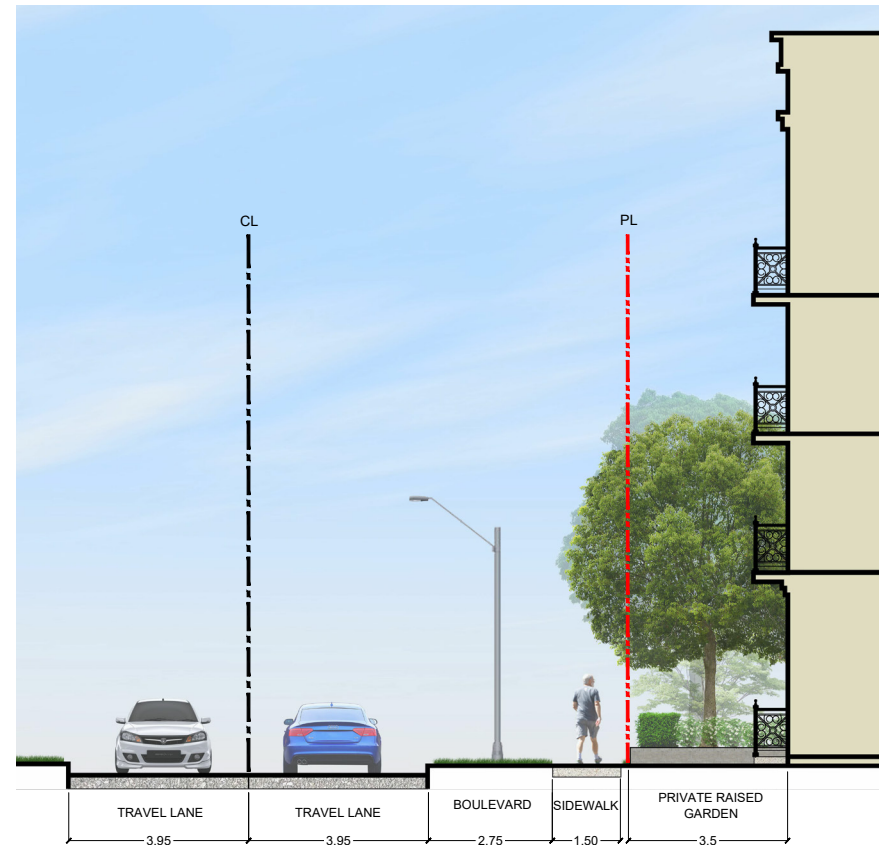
Saw Whet Boulevard Streetscape Cross-Section
